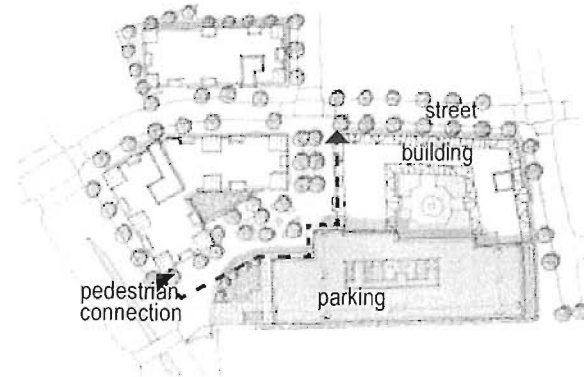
c.2 & 4 site plan with access to parking behind buildings fronting the street and connections through the site to surrounding streets
